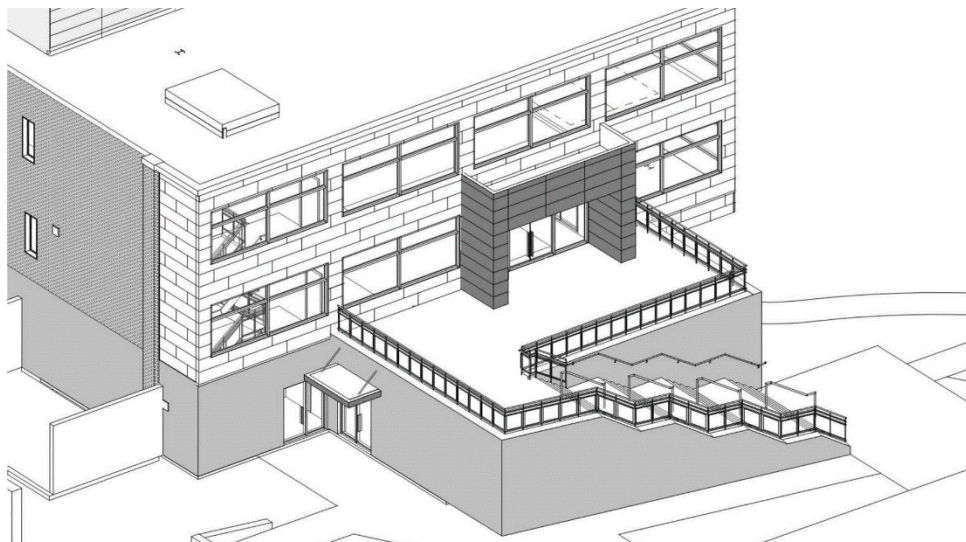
Close-up of the southeast elevation showing the new entrance, and where the fiber cement panels will wrap the corner and die into a brick column to create a transition from the new material to the existing brick
